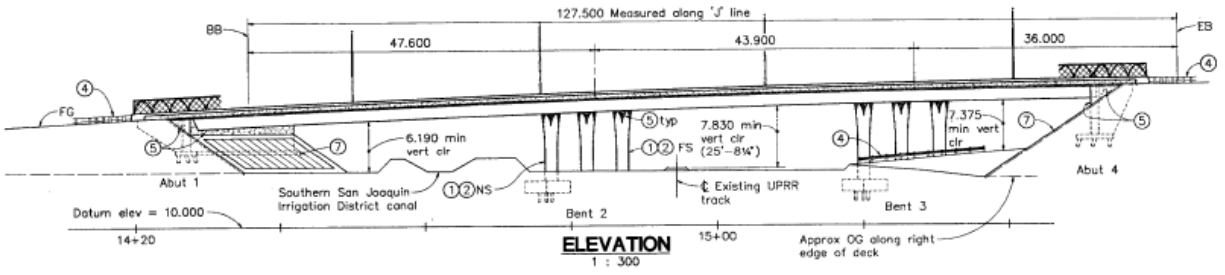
2: The Jack Tone Road Overhead (Bridge C) Shown in Elevation (Source: California Department of Transportation structural drawings)
